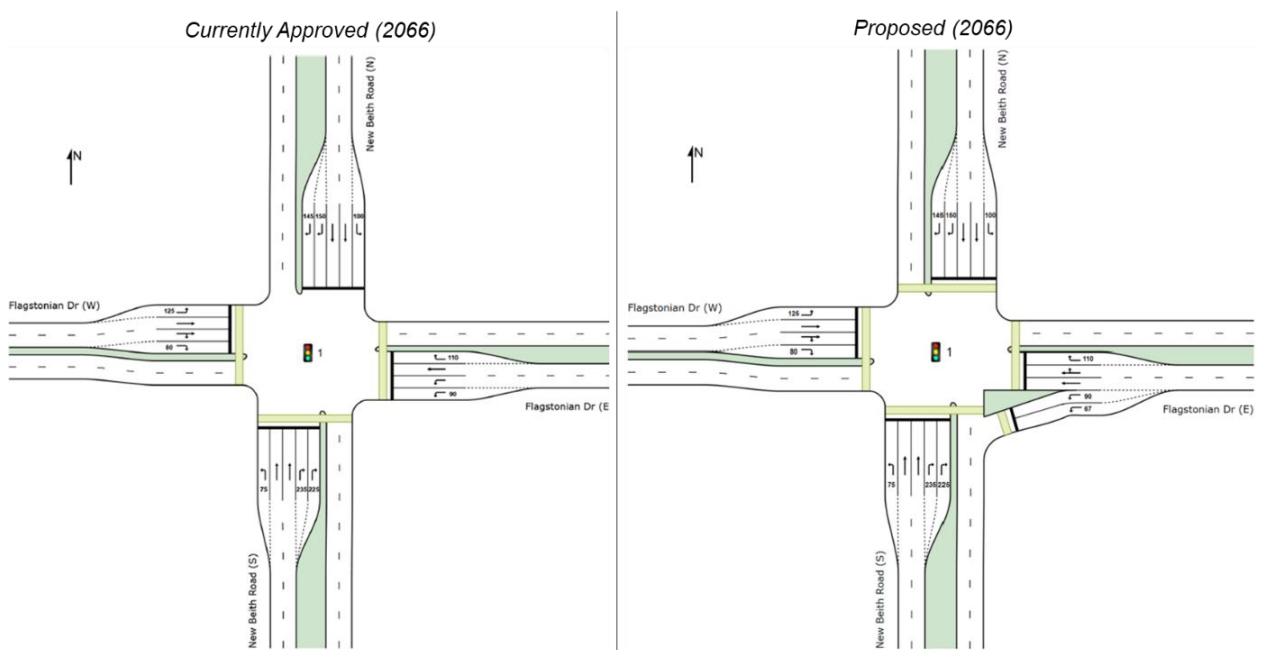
Flagstonian Drive / New Beith Road SIDRA Intersection Layout
